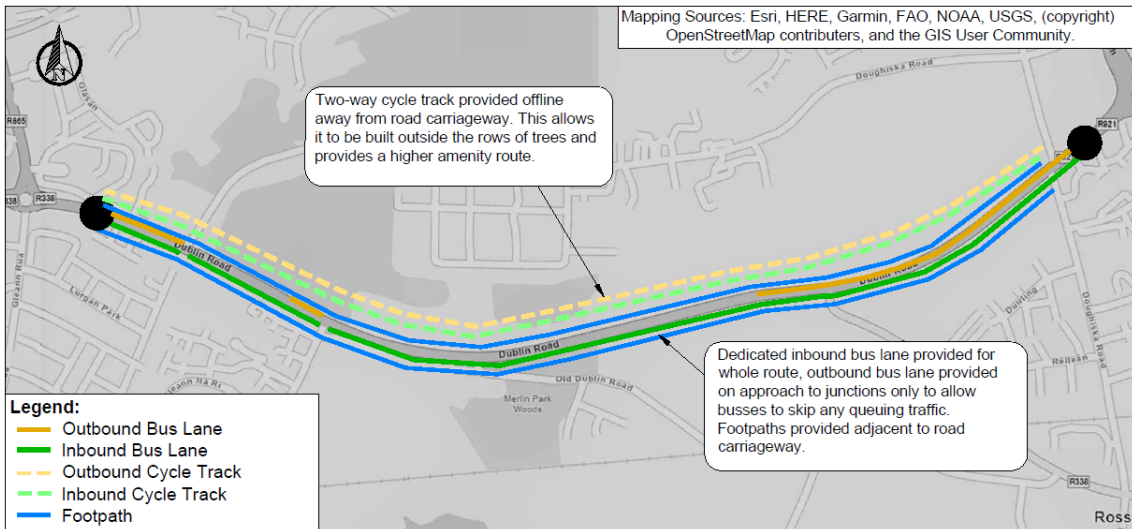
Section 2 Option 8 Indicative Scheme Design
